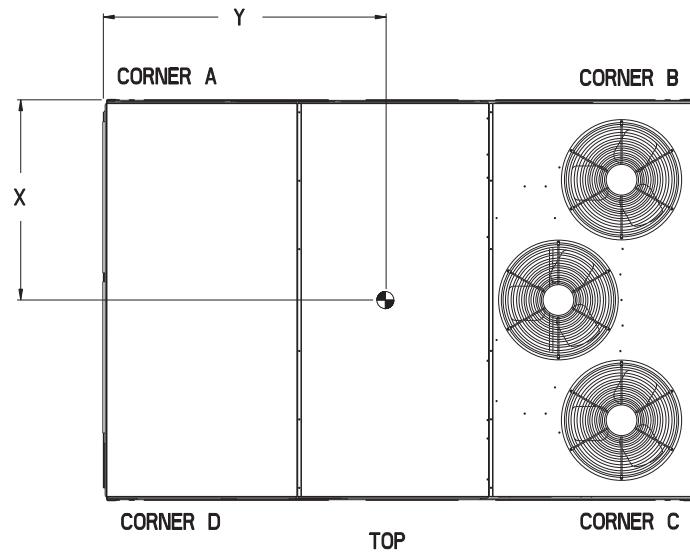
Unit Dimensional Drawing – Size 17 Units
